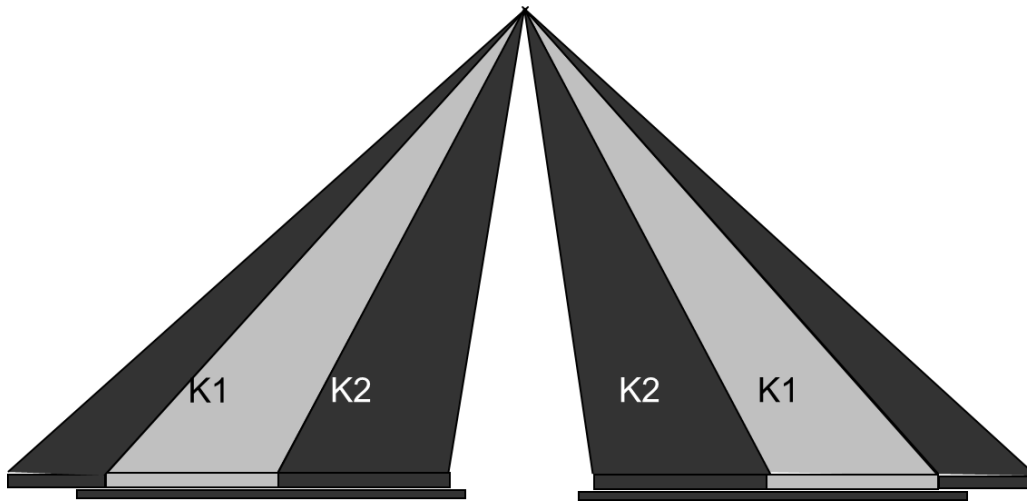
Pavement with shoulders and high speed lane (K2) in asphalt and low speed lane (K1) in concrete.
